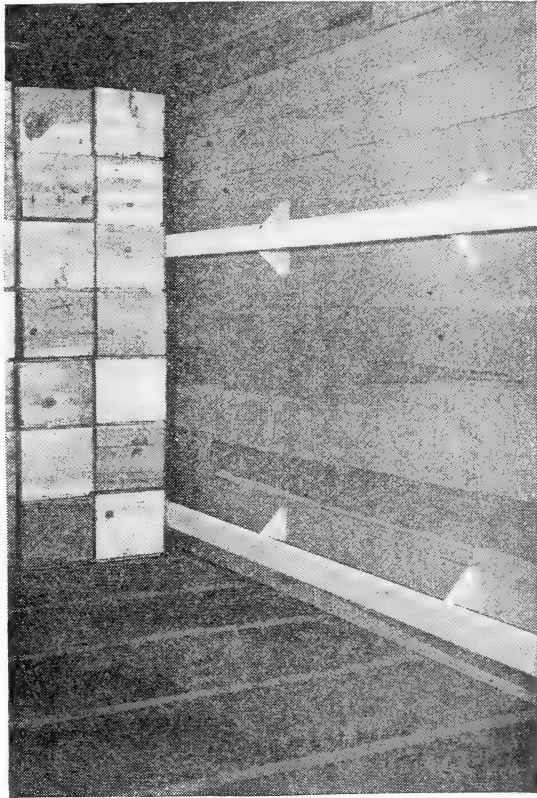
Side rails used in cold-storage rooms to prevent stacking against the walls.
